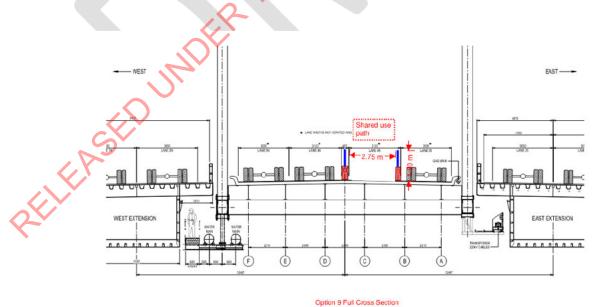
Option 9 section, option 10 similar but with central two lanes into shared use path
